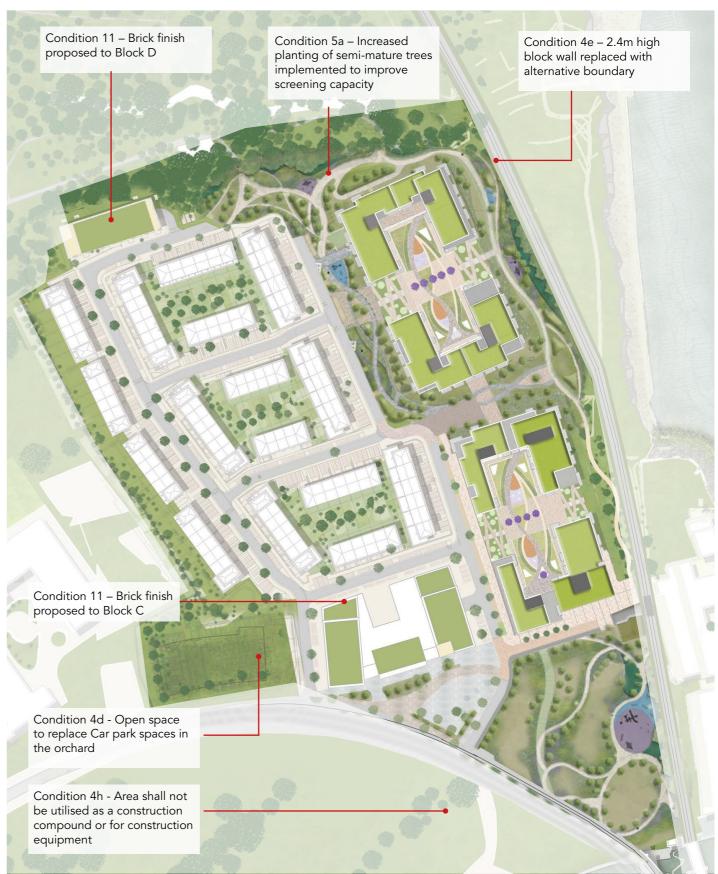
Overall site layout with areas amended under ABP-311181-21 planning conditions
